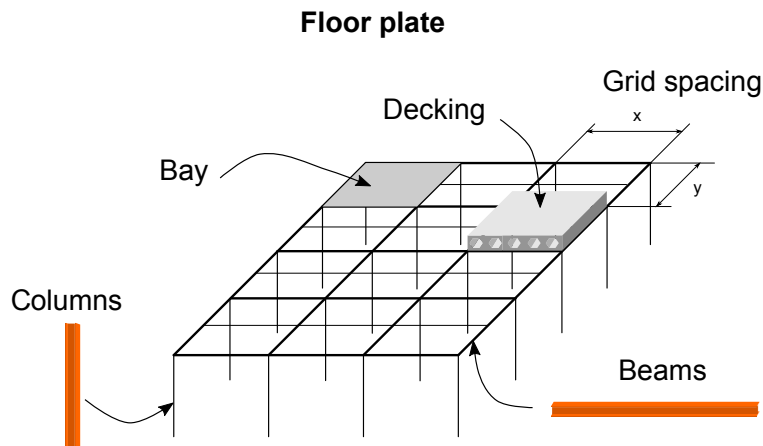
Visual representation of the key concepts and words used to describe a floor plate. Bays are spaces separated by (commonly) four columns, ‘decking’ refers to the type of floor. Beams and columns are steel I-sections.
